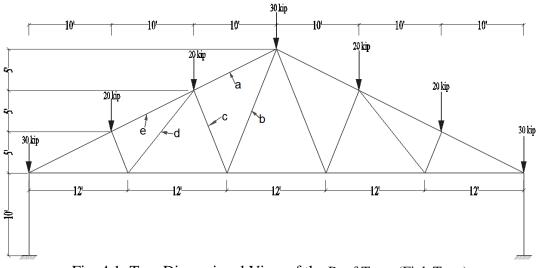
Two Dimensional View of the Roof Truss (Fink Type)
